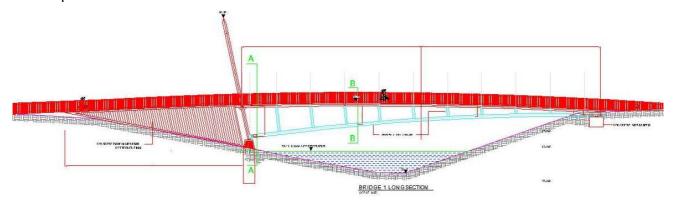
Bridge 1 – Dodder Valley Bridge Proposed Elevation
